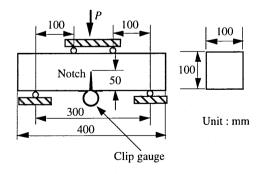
Three-Point Bending Test of Notched Beam (Concrete)
